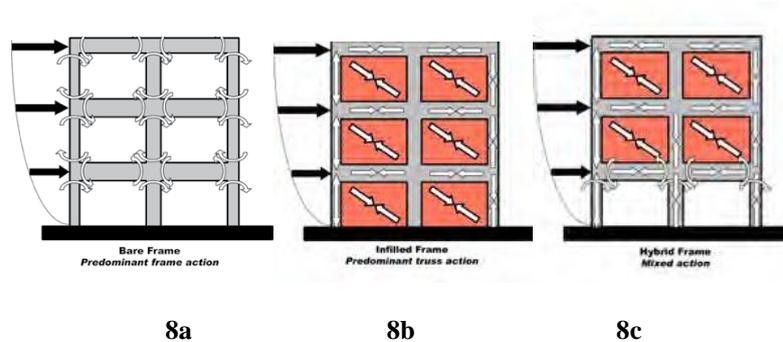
Performance of RC Frames with and Without Masonry Infill Walls [2]
